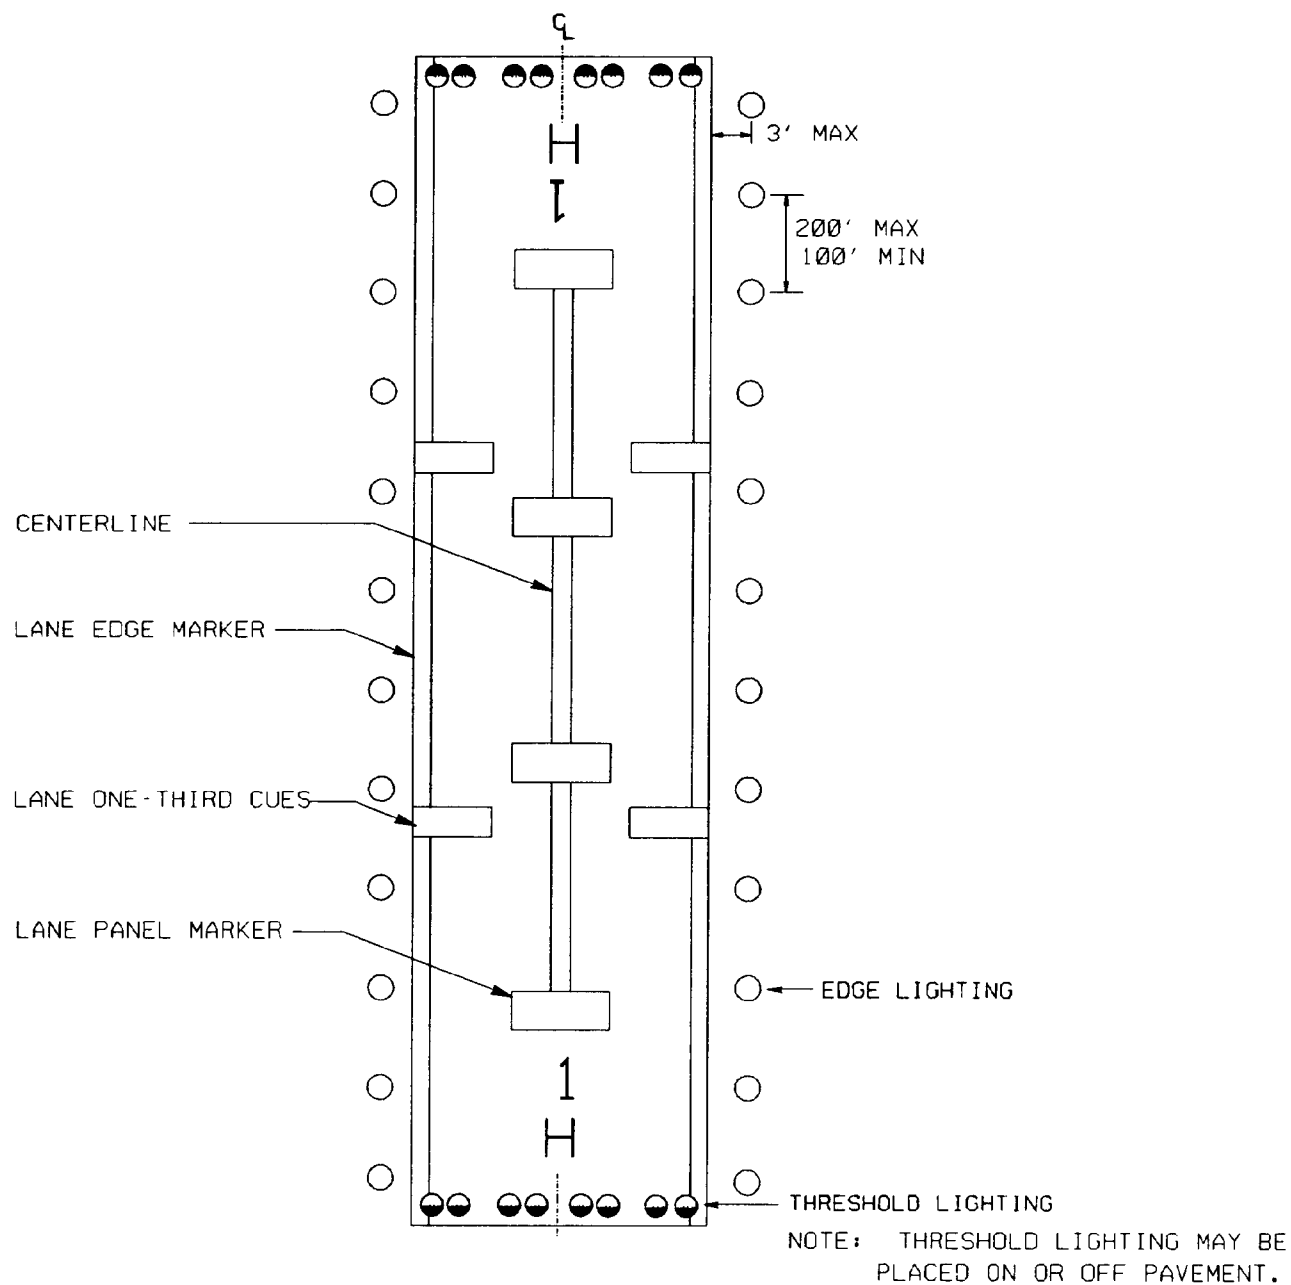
Typical layout of Army Helicopter stagefield lighting system.
